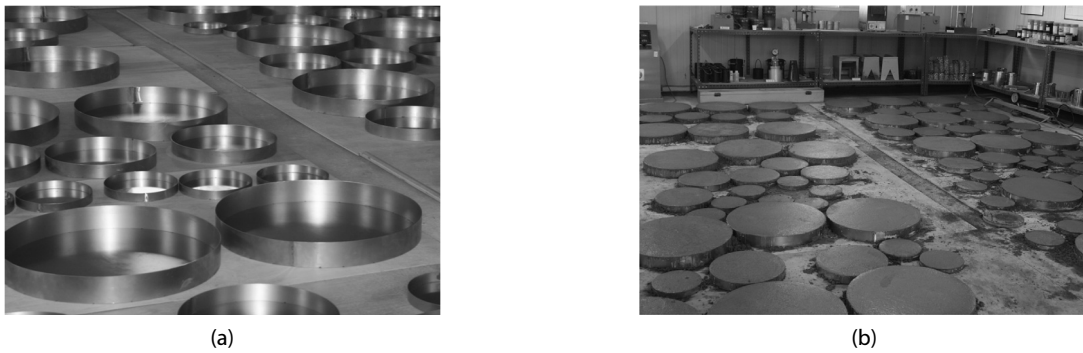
(a) steel molds for round specimens, and (b) concrete specimens
